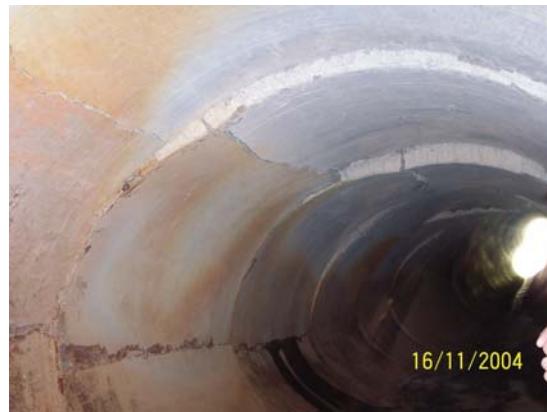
Flexural problem in RC culvert (note compression crack at mid way of the wall)
